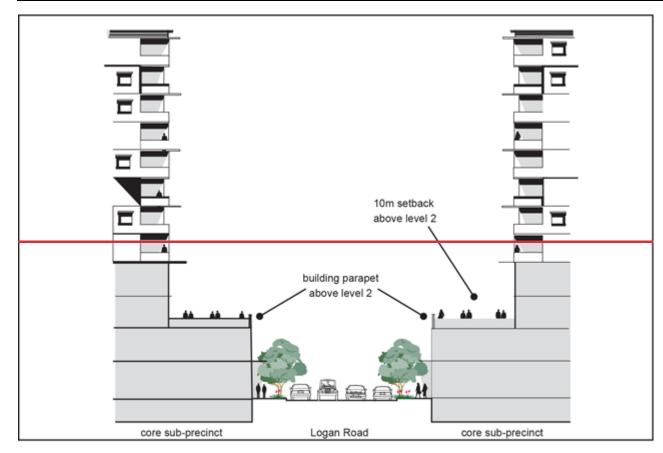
Logan Road cross section, Stones Corner precinct
